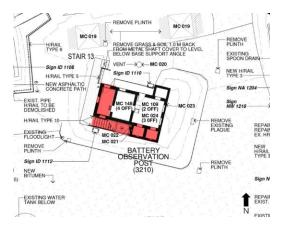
The Battery Observation Post was modified during WWII. The observation level was extended over the ground floor stores, a single storey extension was added to the west, and a new steel staircase leading to the observation level was added. (Source: Part Site Plan - North Above Ground, 2005, Suters Architects)
